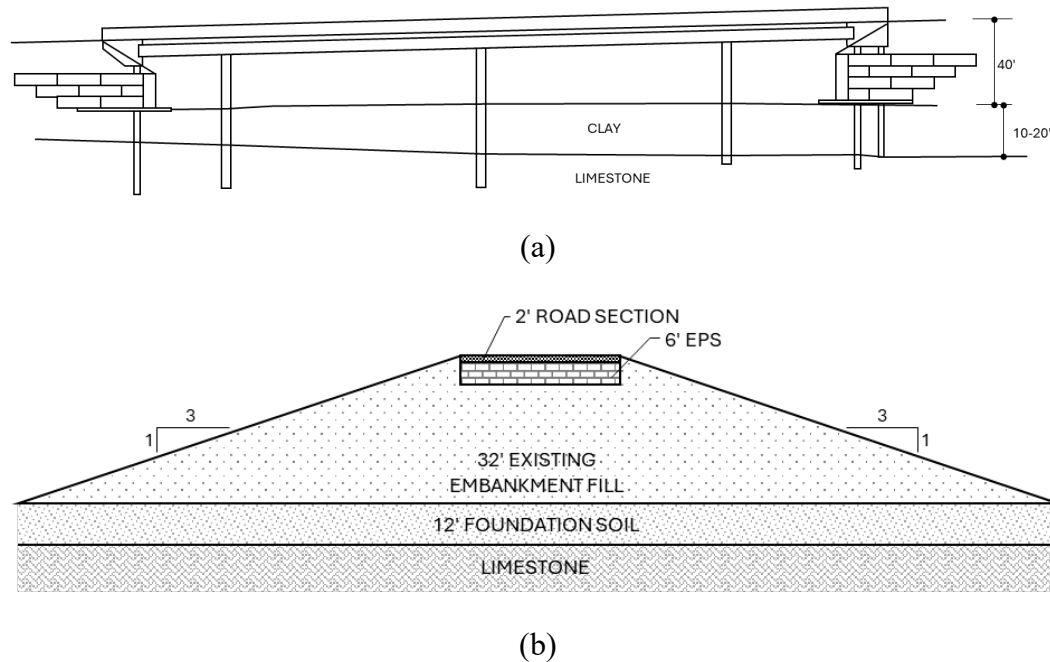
(a) Longitudinal section of US 67 bridge over SH 174 (redrawn after Puppala et al. 2019); and (b) typical cross-section of embankment (redrawn from Puppala n.d.).
